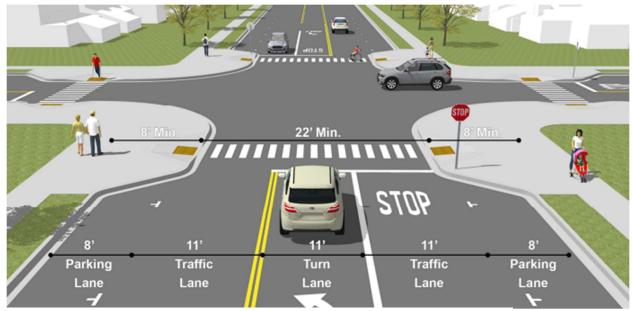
Typical Cross Section with Curb Extensions (Source: SDC ATP: Appendix B – ATP Toolbox)
